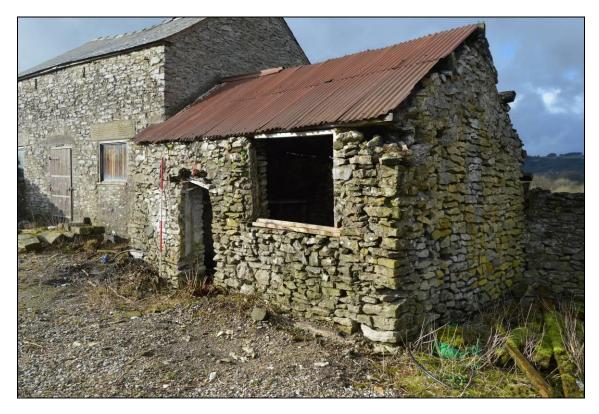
South elevation of building 2 (facing north west). Scale 2m.
